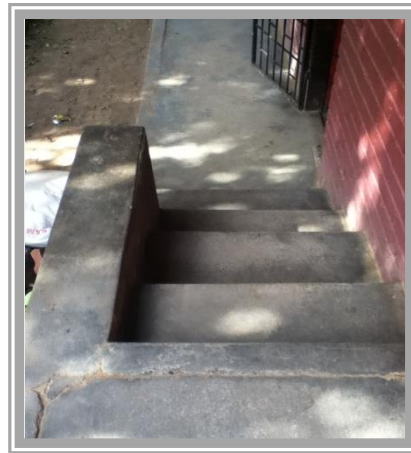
Steep staircase leading to a classroom without hand railings or staircase railings
